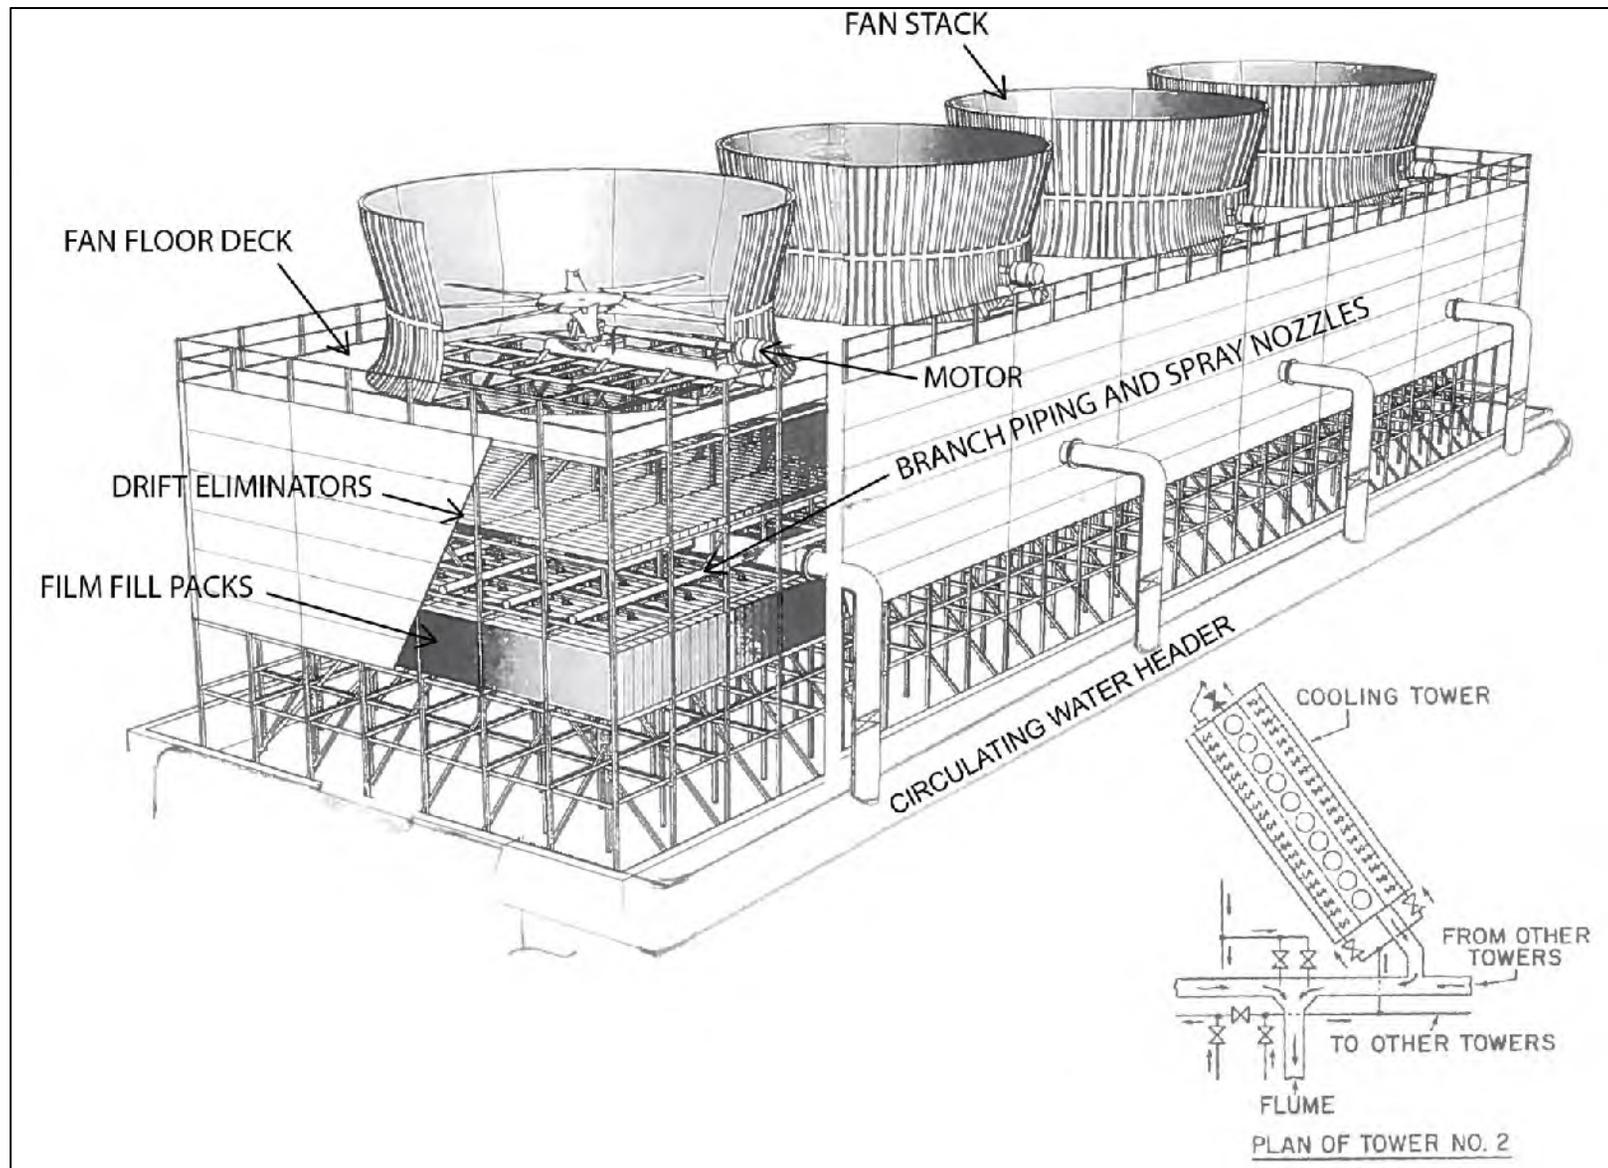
Schematic of Clinch River Plant Cooling Tower
